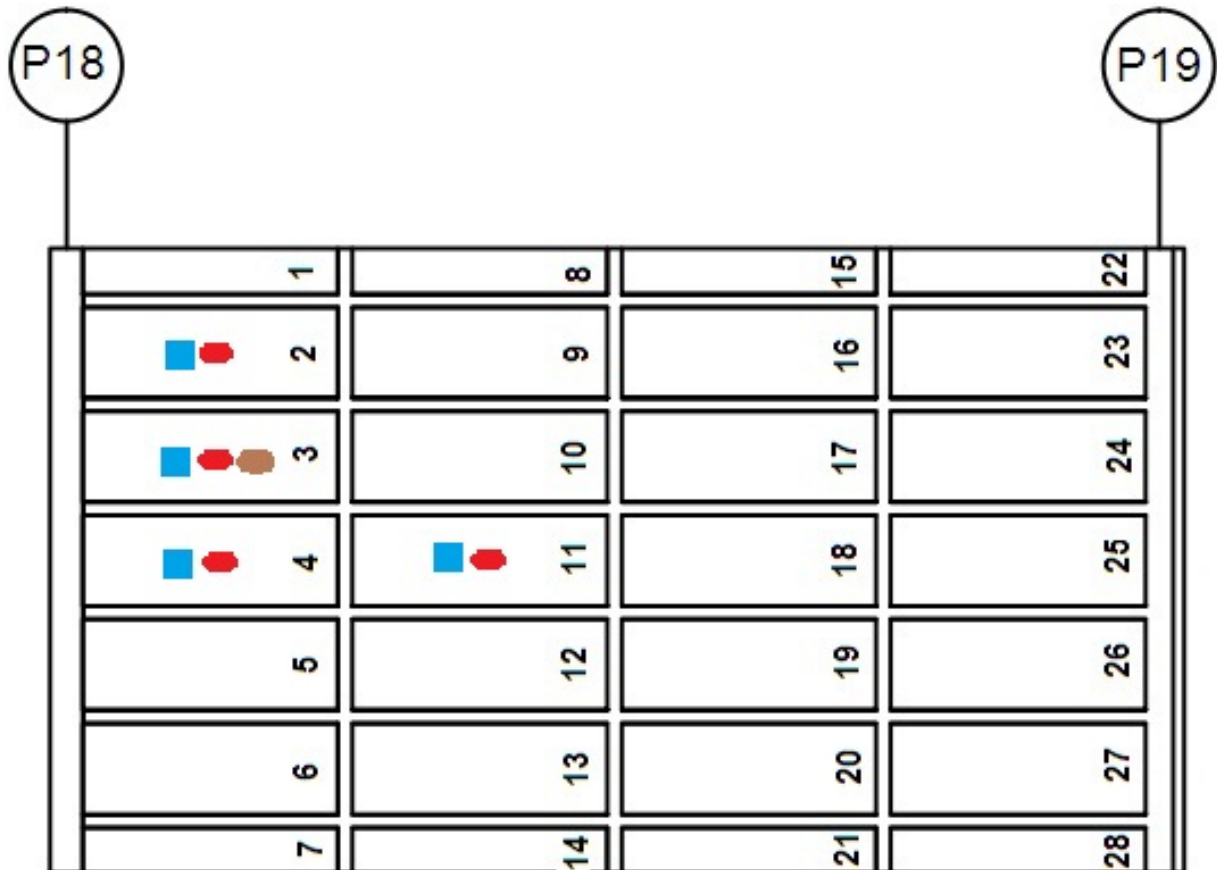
Test conducted at various locations between Pier P18 and Pier P19
